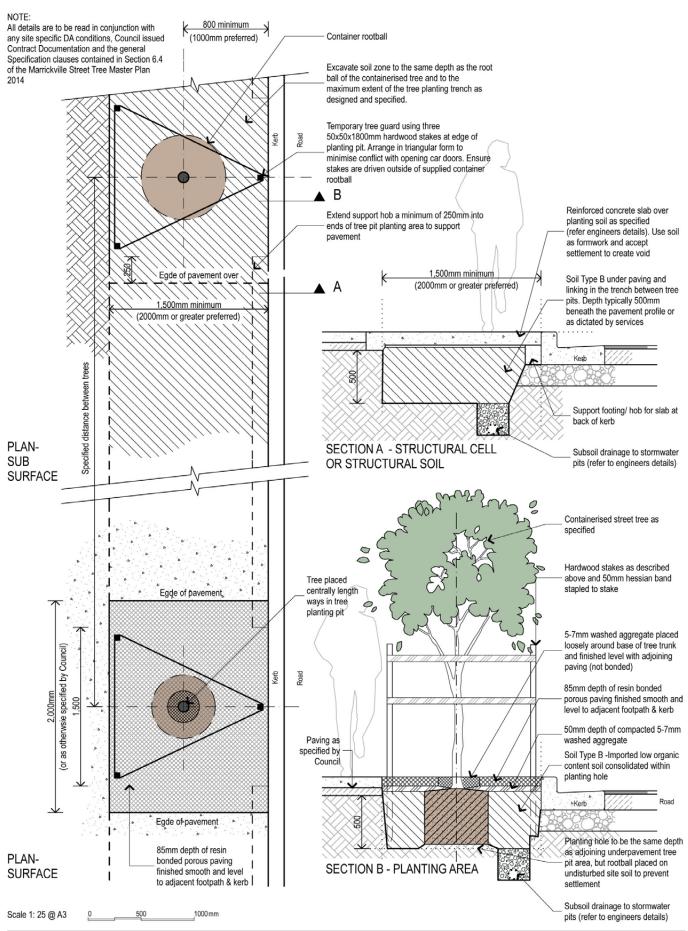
TREE PLANTING IN FULLY PAVED VERGE WITH EXPANDED TREE PIT GARDEN
